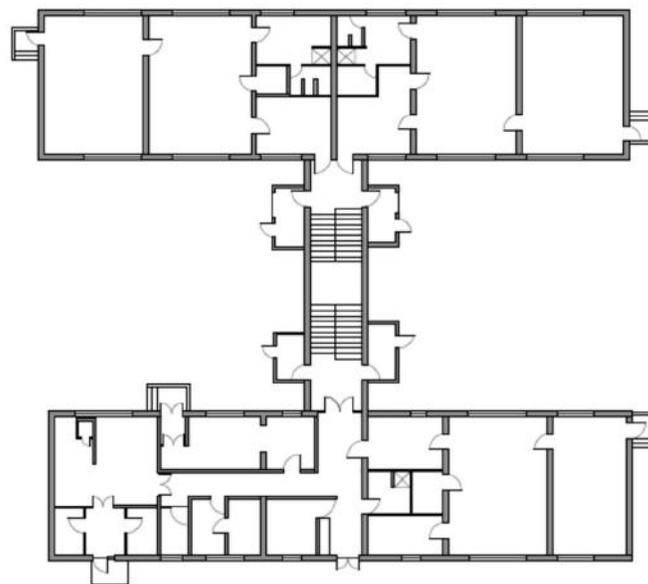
Typical plan of a masonry school building (kindergarten Ak Tilek, Balykchy).
